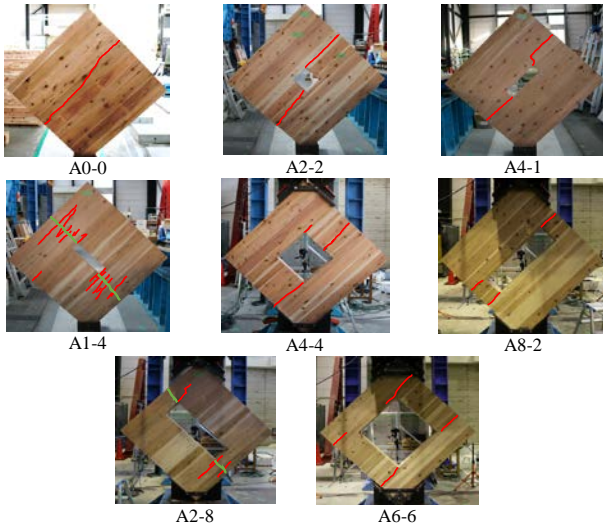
Cracks observed on the surface layer of CLT panels after failure
